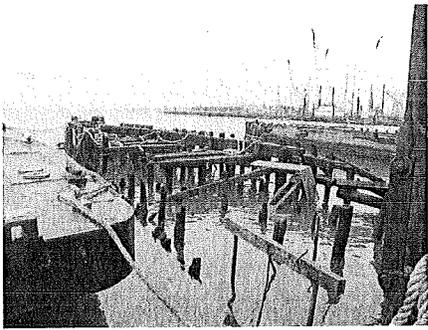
South side of barge, southern fender system in poor condition with missing cross bracing and horizontal timbers, cutoff piles and debris, looking southeast.
